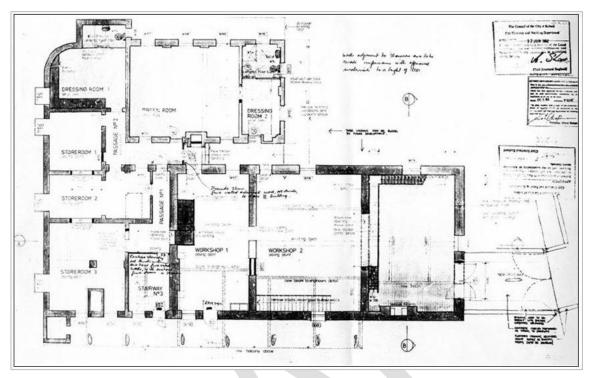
1982 Basement plan, showing the proposed works to convert the former kitchen and dining rooms to workshops and dressing rooms for the Marionette Theatre. (Source: City of Sydney Archives 539/1/82)
